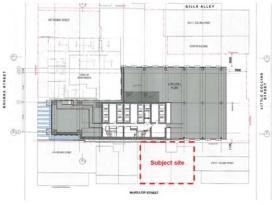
Level 9 of endorsed plans for 405 Bourke Street
